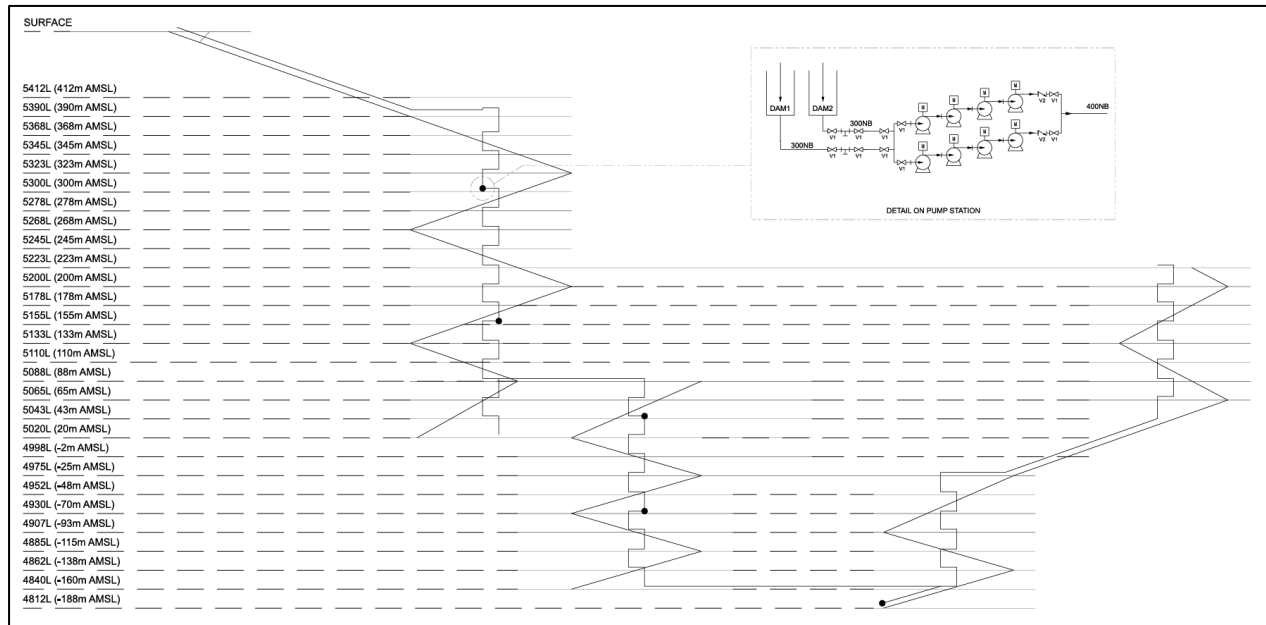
Mine Water Handling and Dewatering System Schematic.
